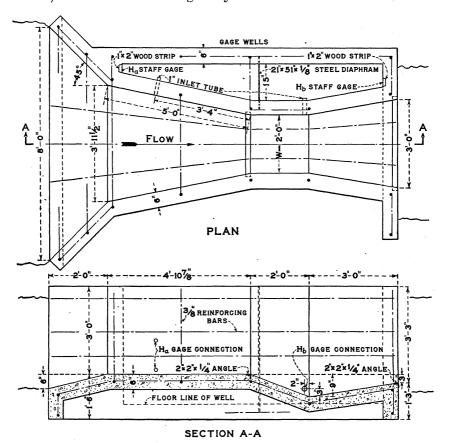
Plan and elevation of a 2-foot reinforced-concrete Parshall measuring flume.
